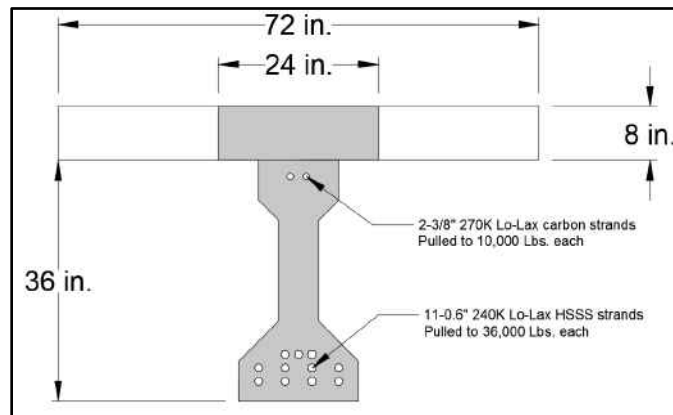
Cross section of modified interior girder (specimens in this study)
